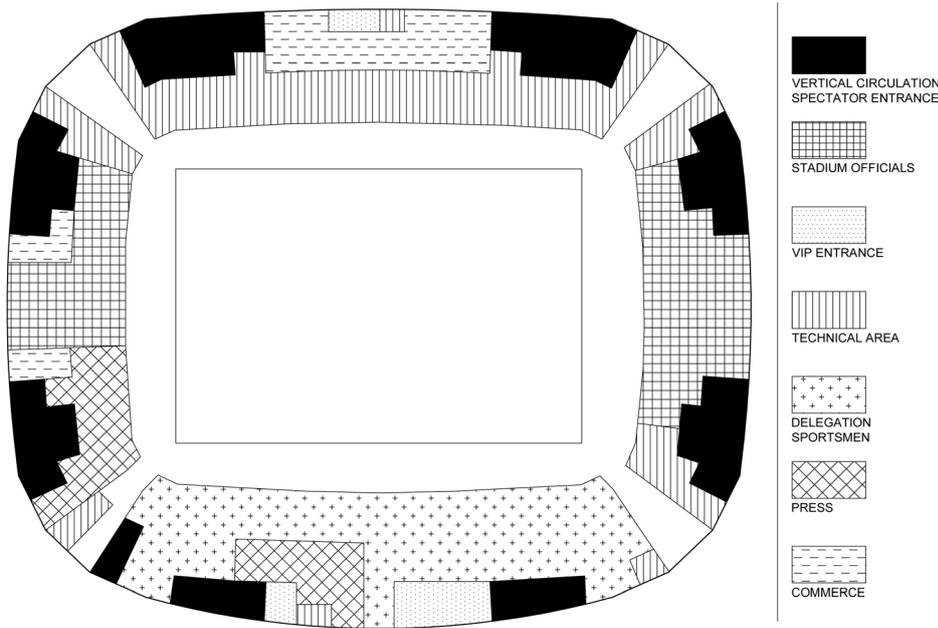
Example ground floor plan; Konya Metropolitan Stadium.
